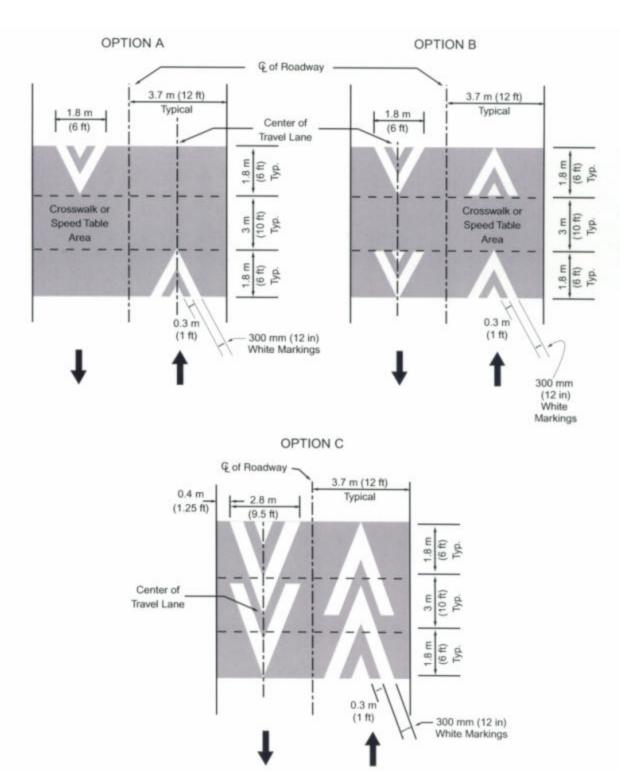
Typical Speed Table Pavement Markings Shown in the MUTCD (FHWA, 1988)
